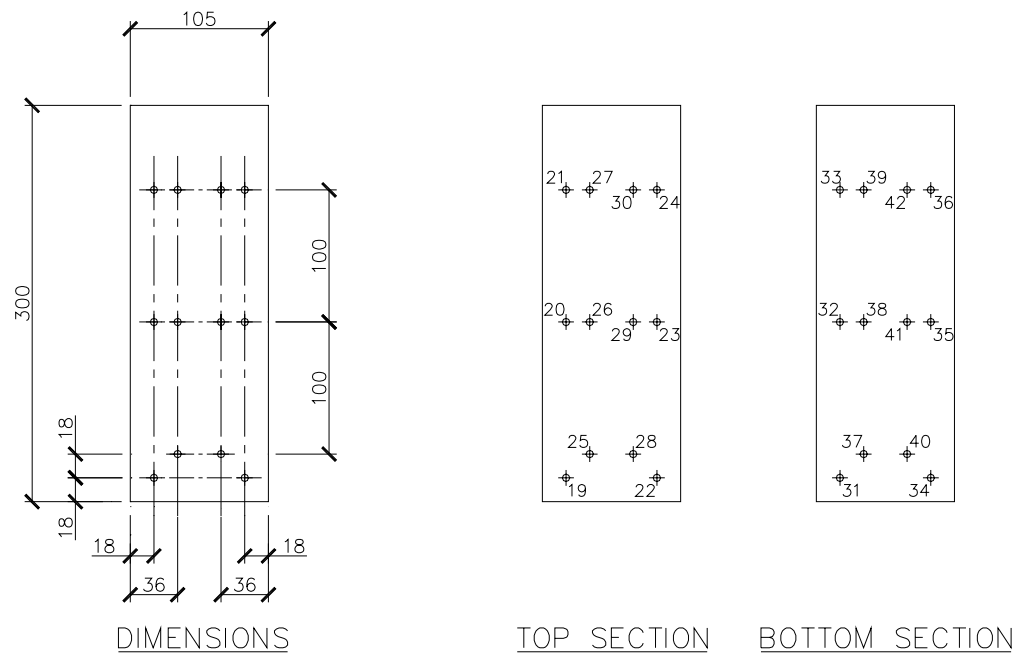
Thermocouple Layout & Dimensions for Tests 1 & 2
